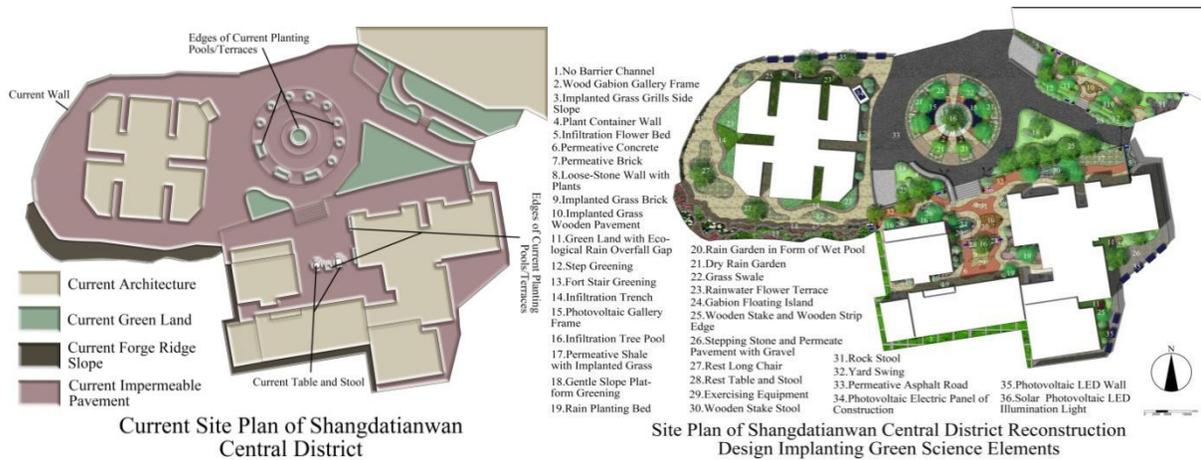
Site Plan of Shangdatianwan Central District Before and after Reconstruction Design
